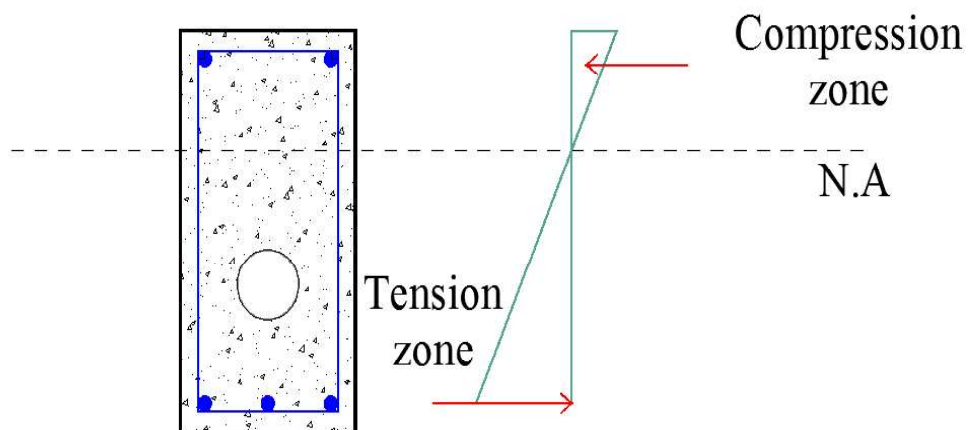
Location of longitudinal cavities within the reinforced concrete section.
